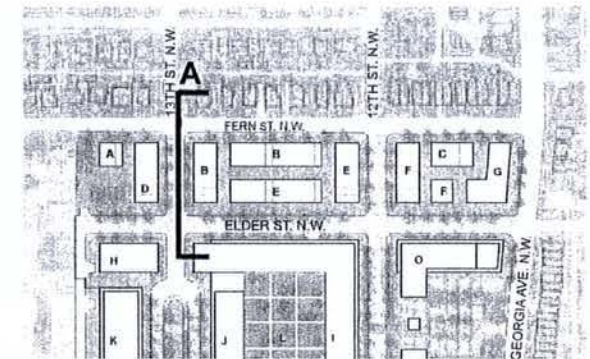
Site Section Key Plan - Fern Street. Source: Perkins+Will.
